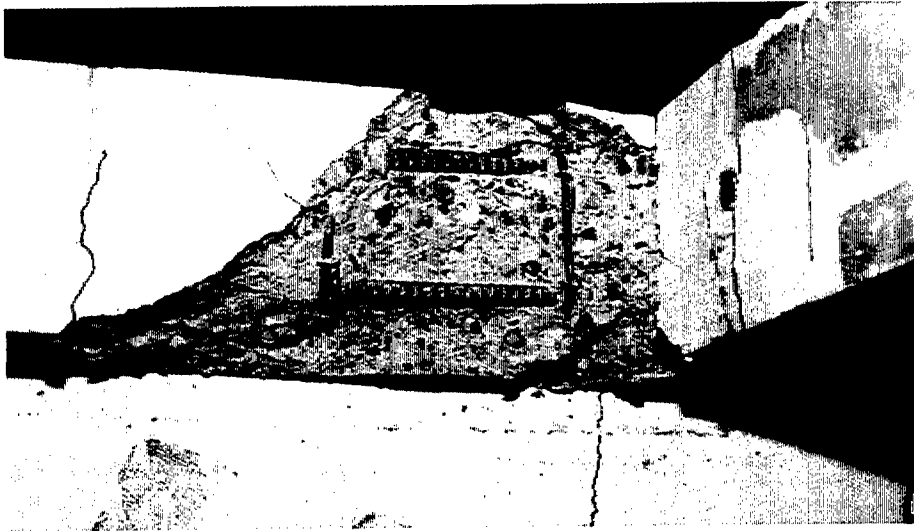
Spandrel, Second Floor, NW Column, East Side, Post-E200N
